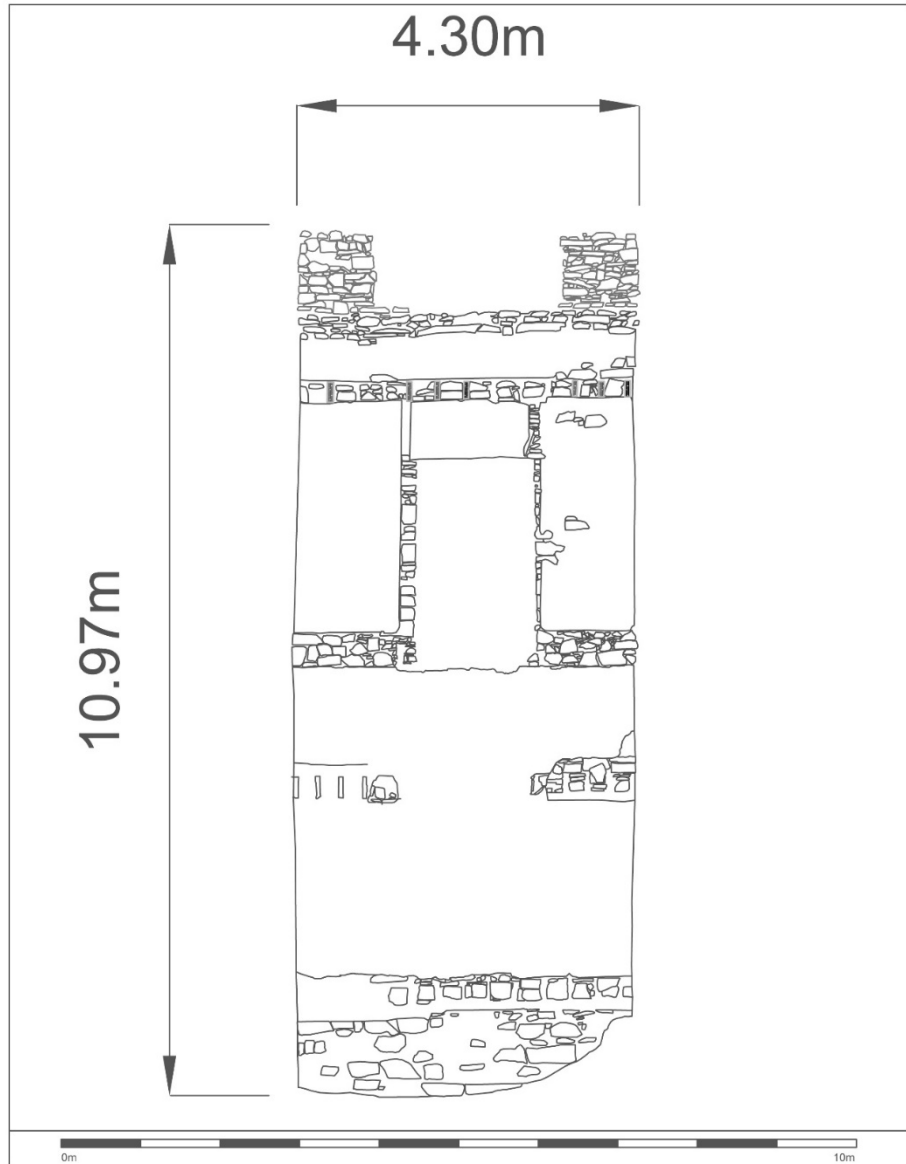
Internal elevation of the north-west wall of the signal tower at Crohy Head Signal Station.
